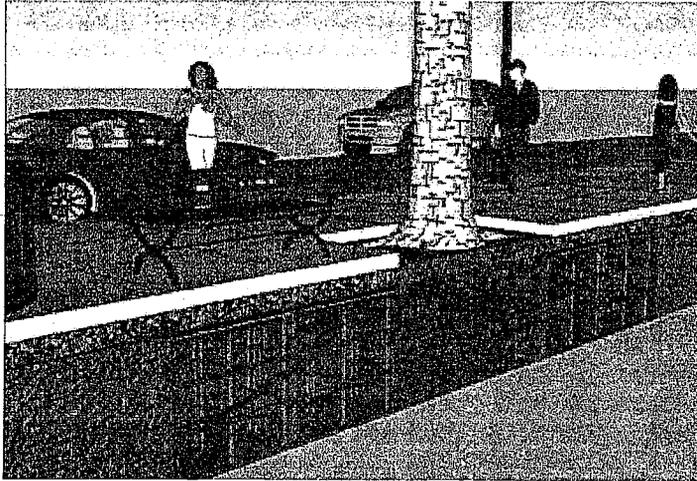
Silva cell structures support the sidewalk while providing root space for street trees
